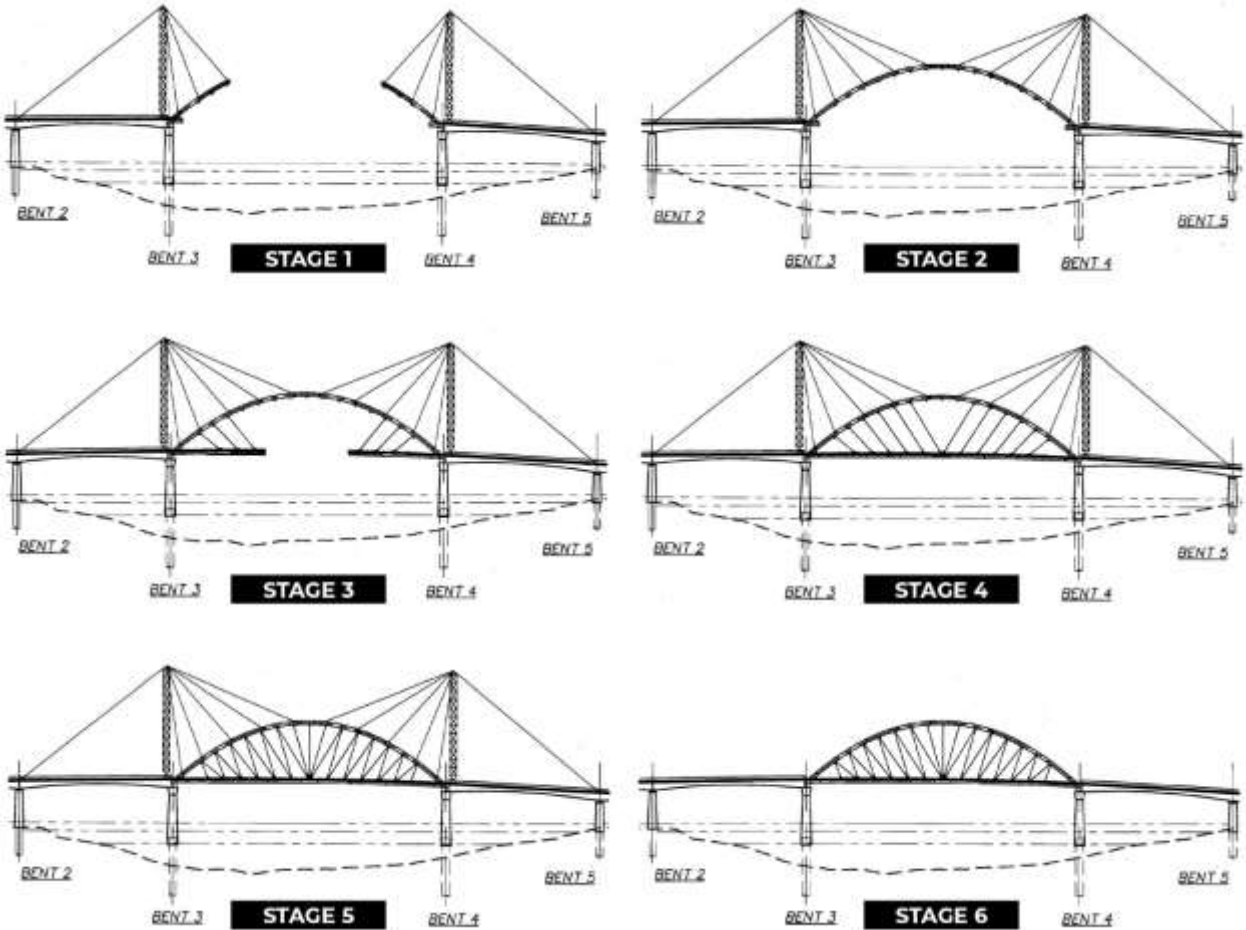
Suggested construction scheme of Sauvie Island Bridge (Wapato Bridge) in Multnomah County, Oregon. A similar method could be employed for arch construction over I-405.
